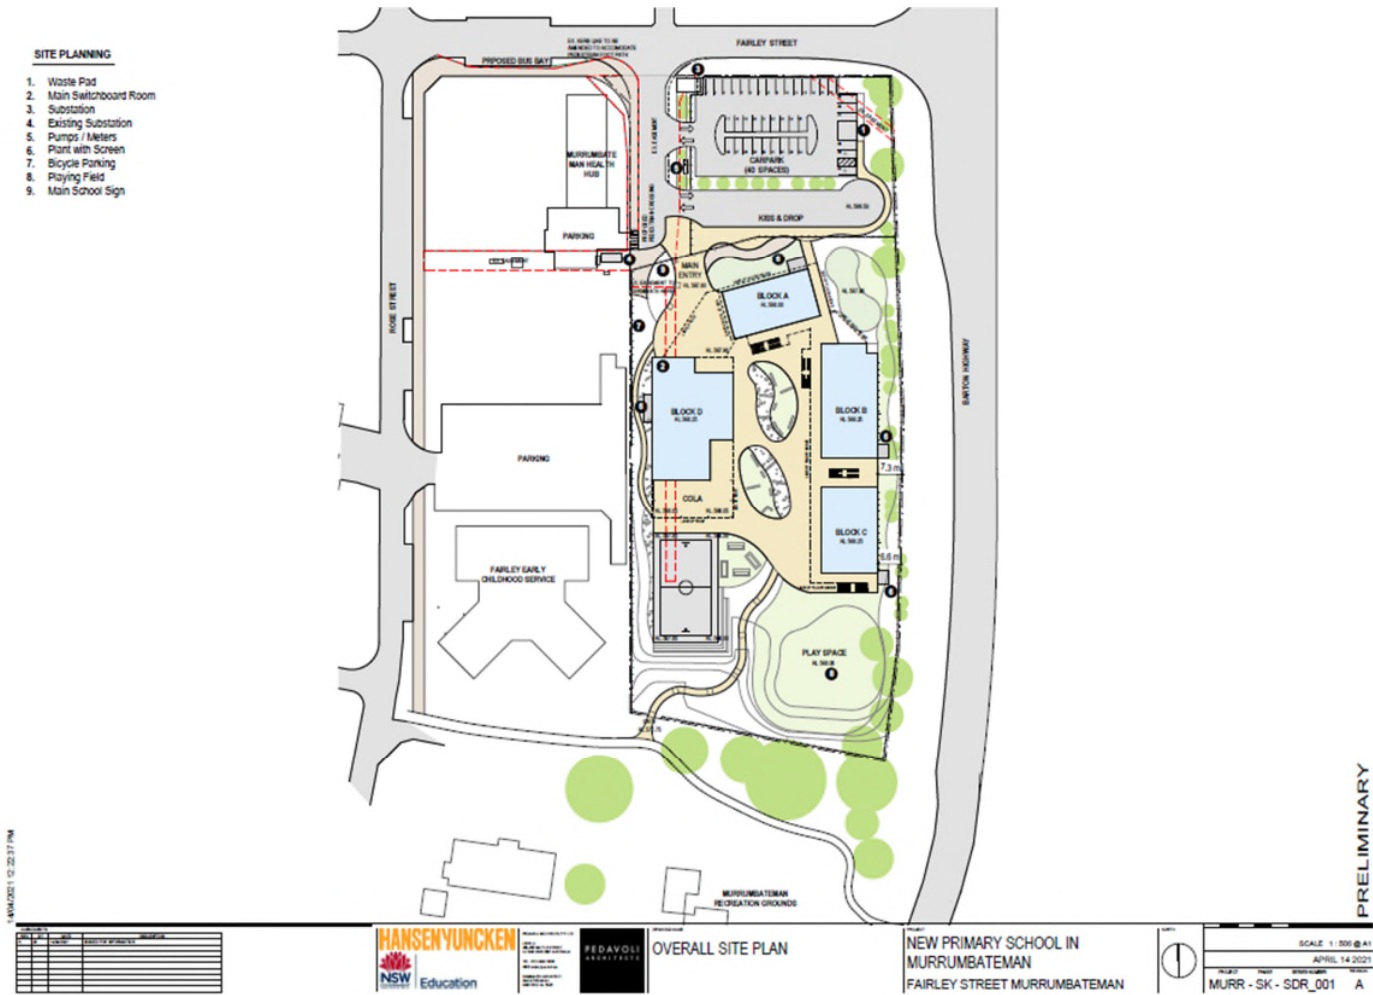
Proposed layout (Hansen Yuncken April 2021)
